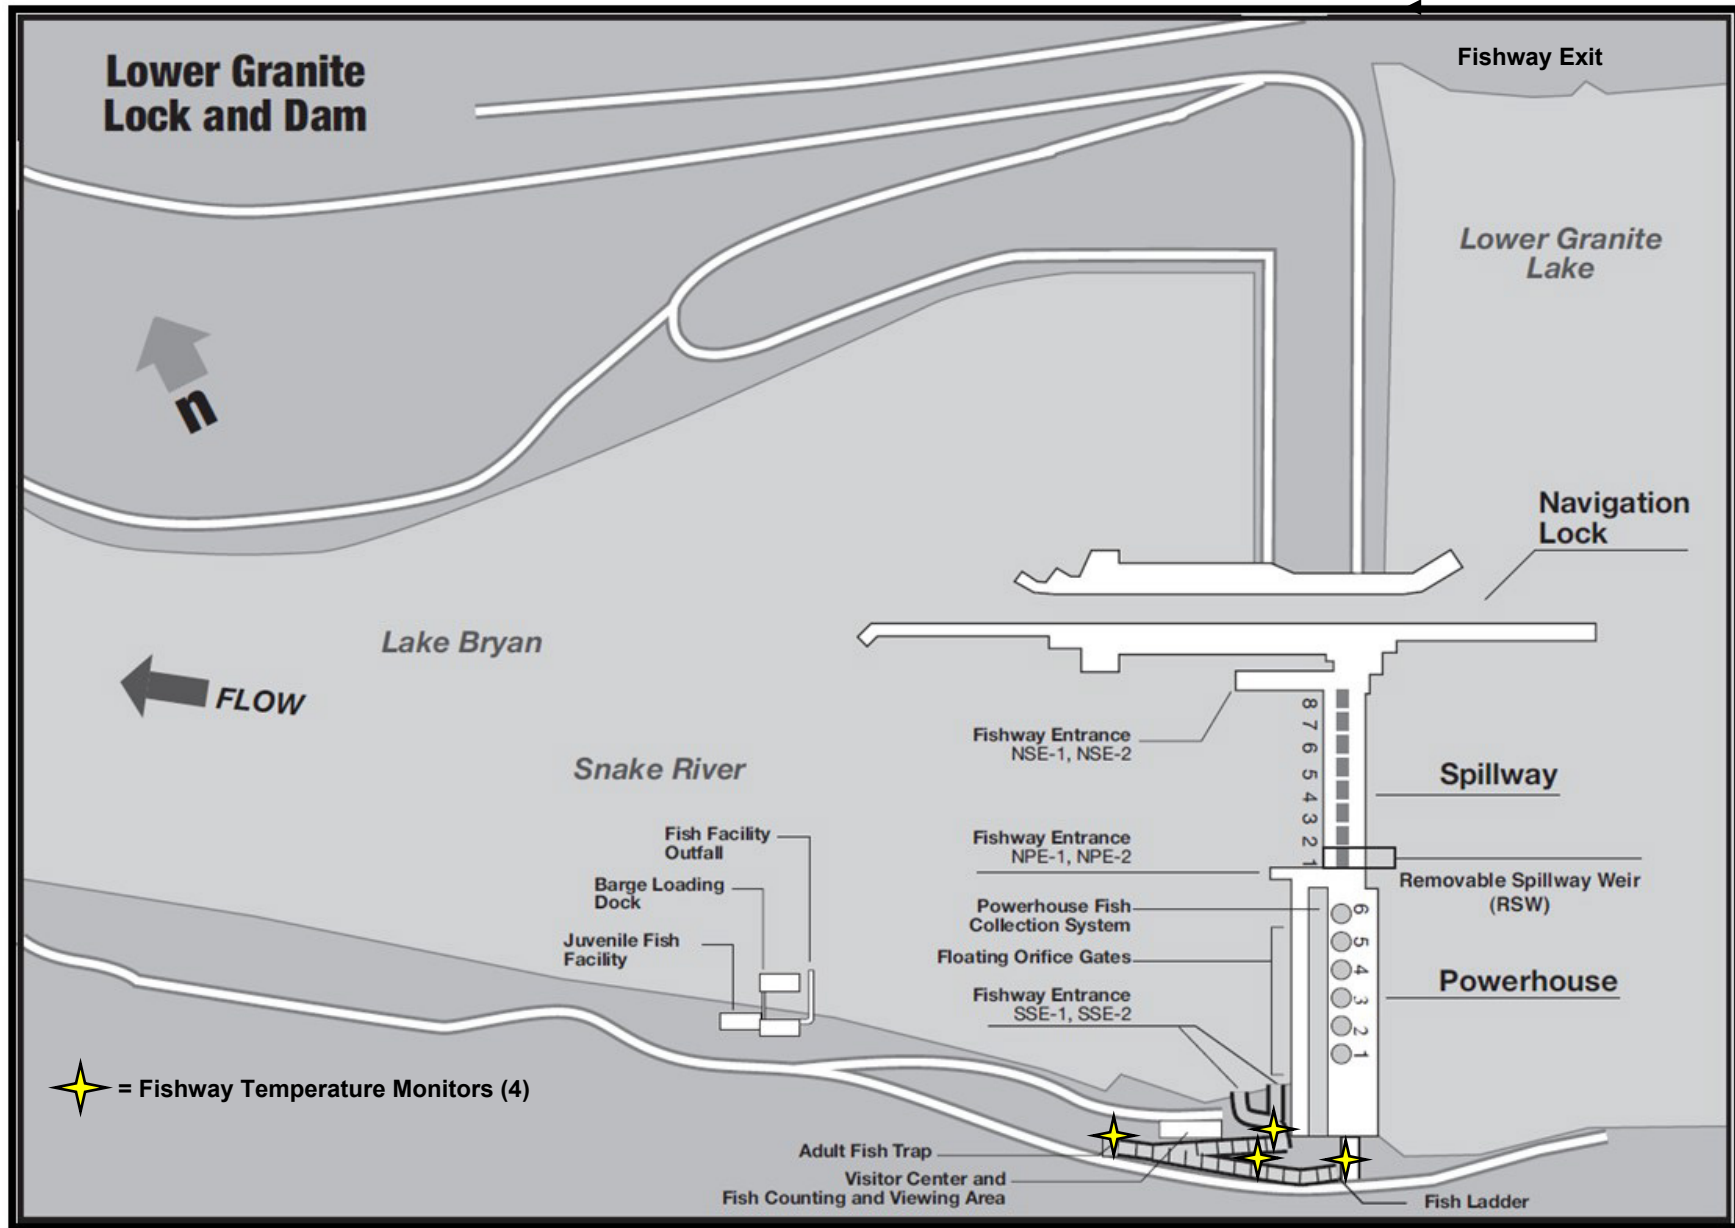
Lower Granite Lock & Dam General Site Plan.
